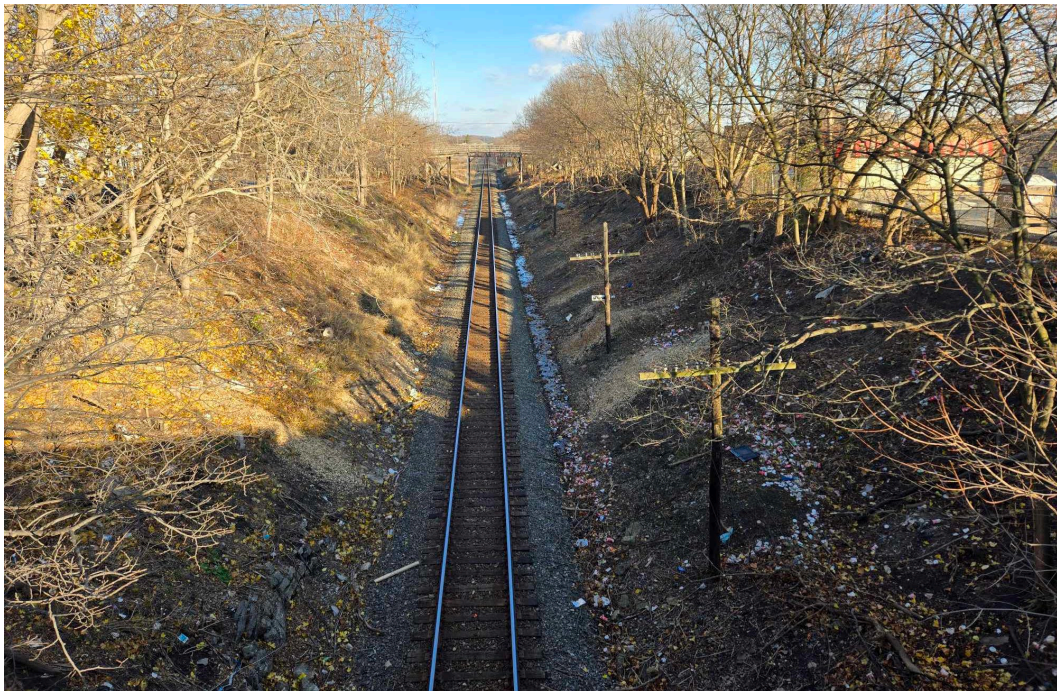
Canadian Pacific Kansas City railway mainline, looking east towards Albert Street Bridge
